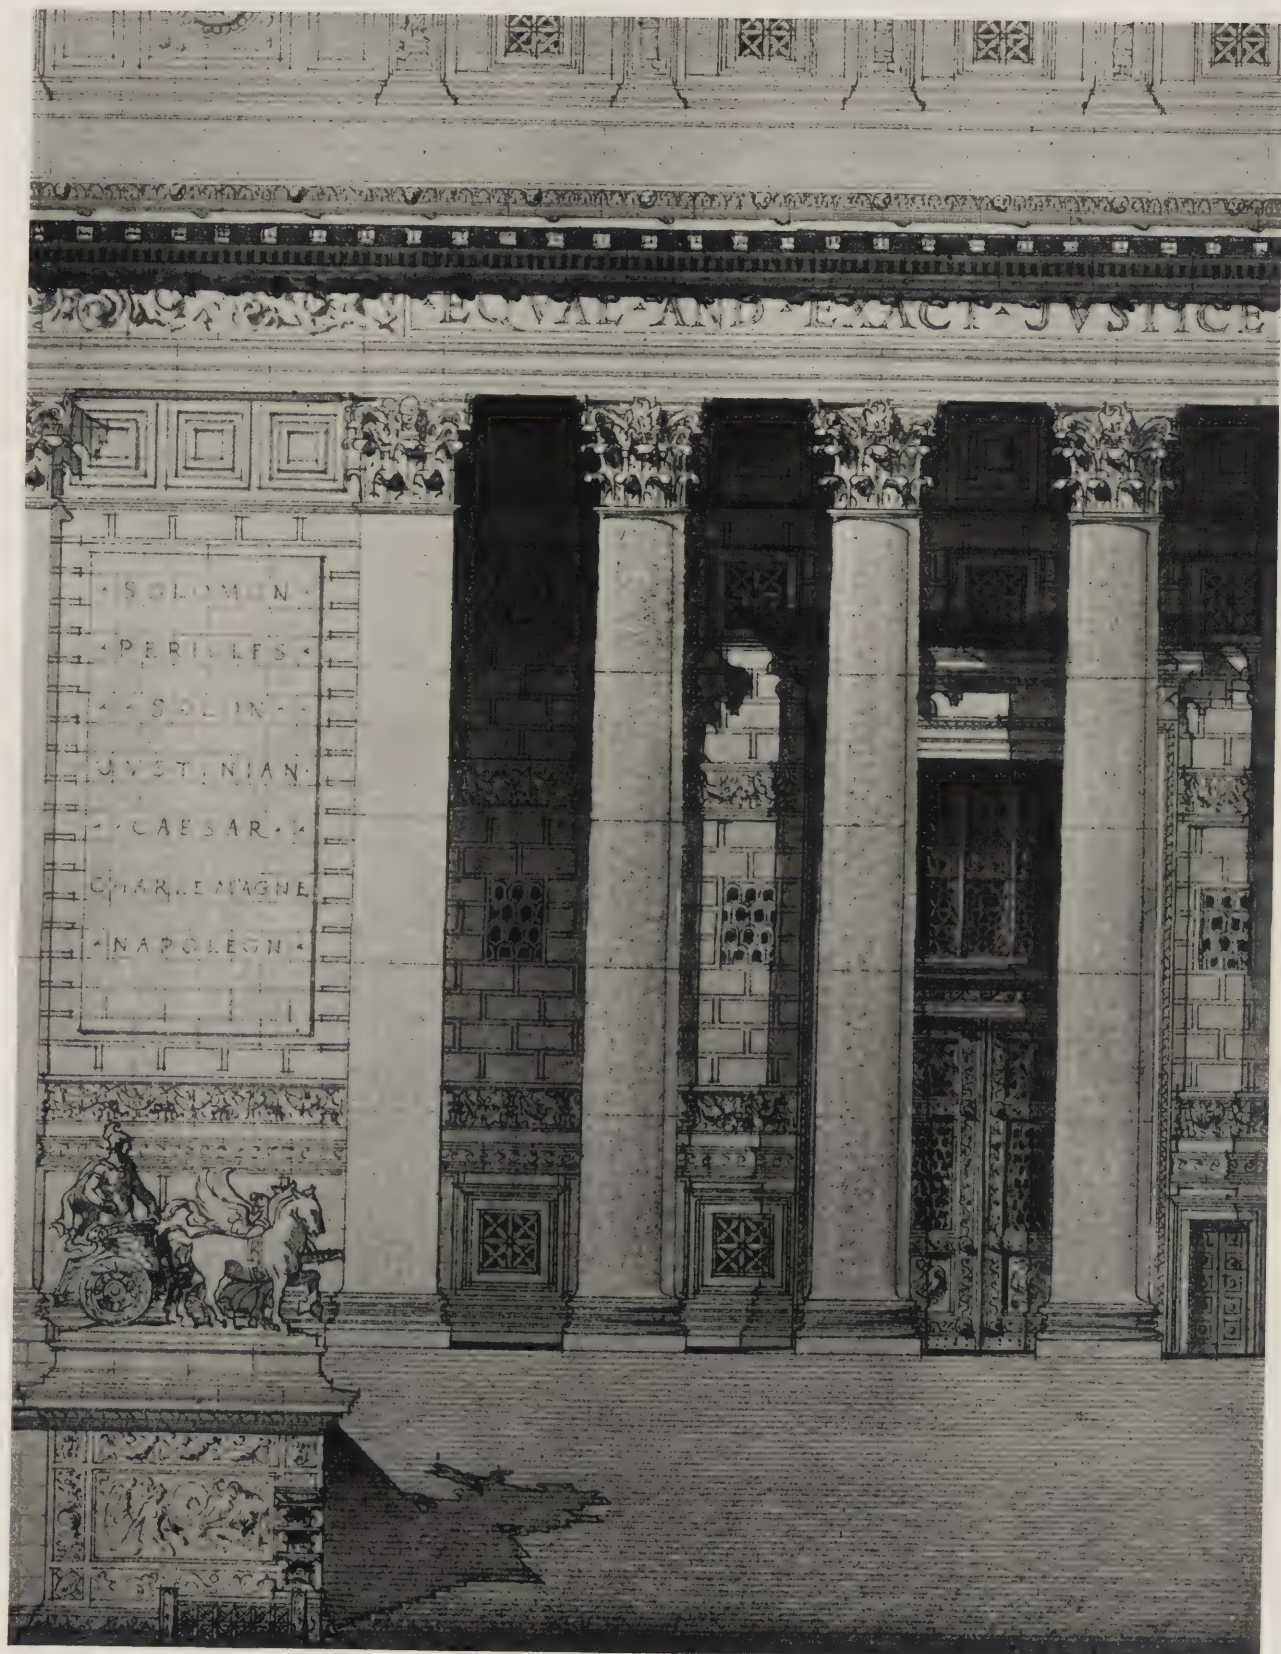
DETAIL OF ELEVATION AT  $\frac{1}{8}$ " SCALE, COMPETITION DRAWING FOR NEW YORK COURT HOUSE
